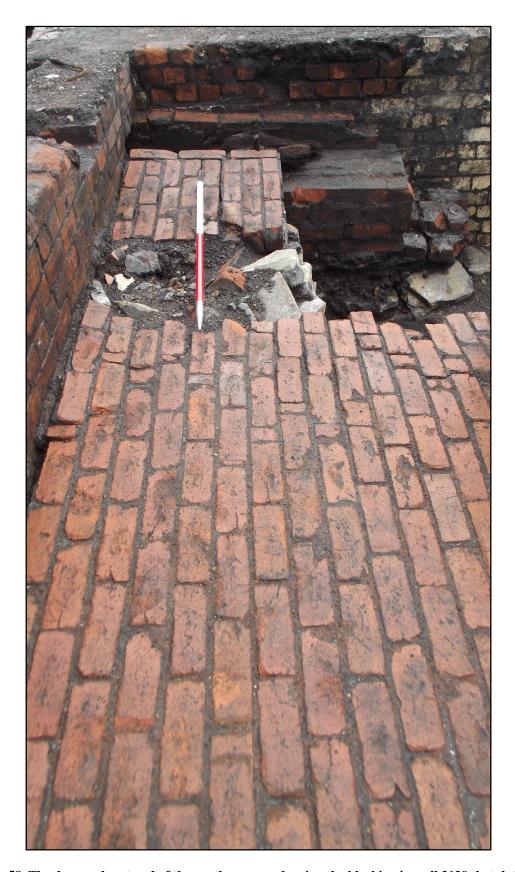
The damaged east end of the north passage showing the blocking in wall 2129 that dates to Phase 3b (1894/5) and which was done during installation of the Sheppard plant. View to east.
